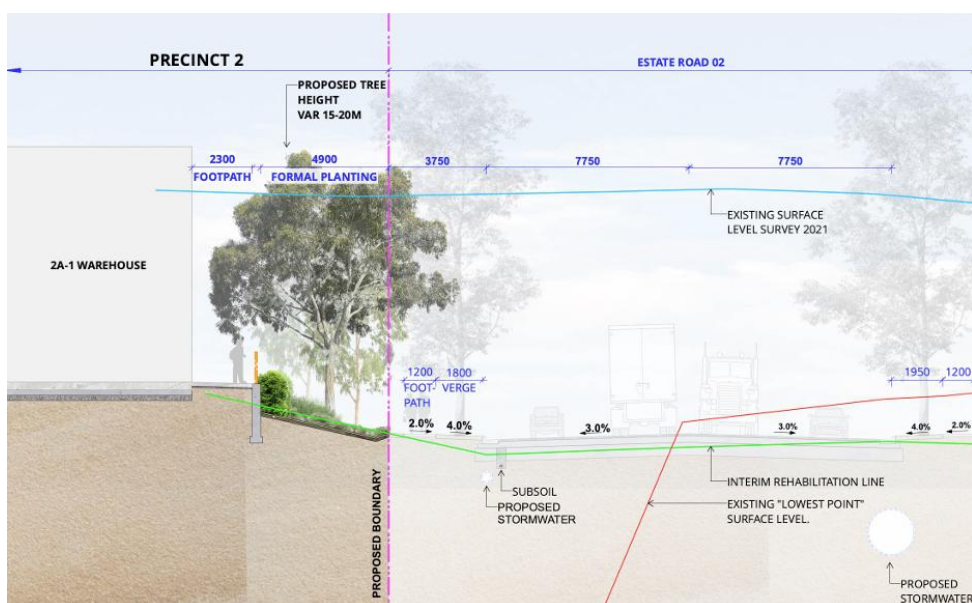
Landscape section showing proposed planted screening (Source: Scape Design)
